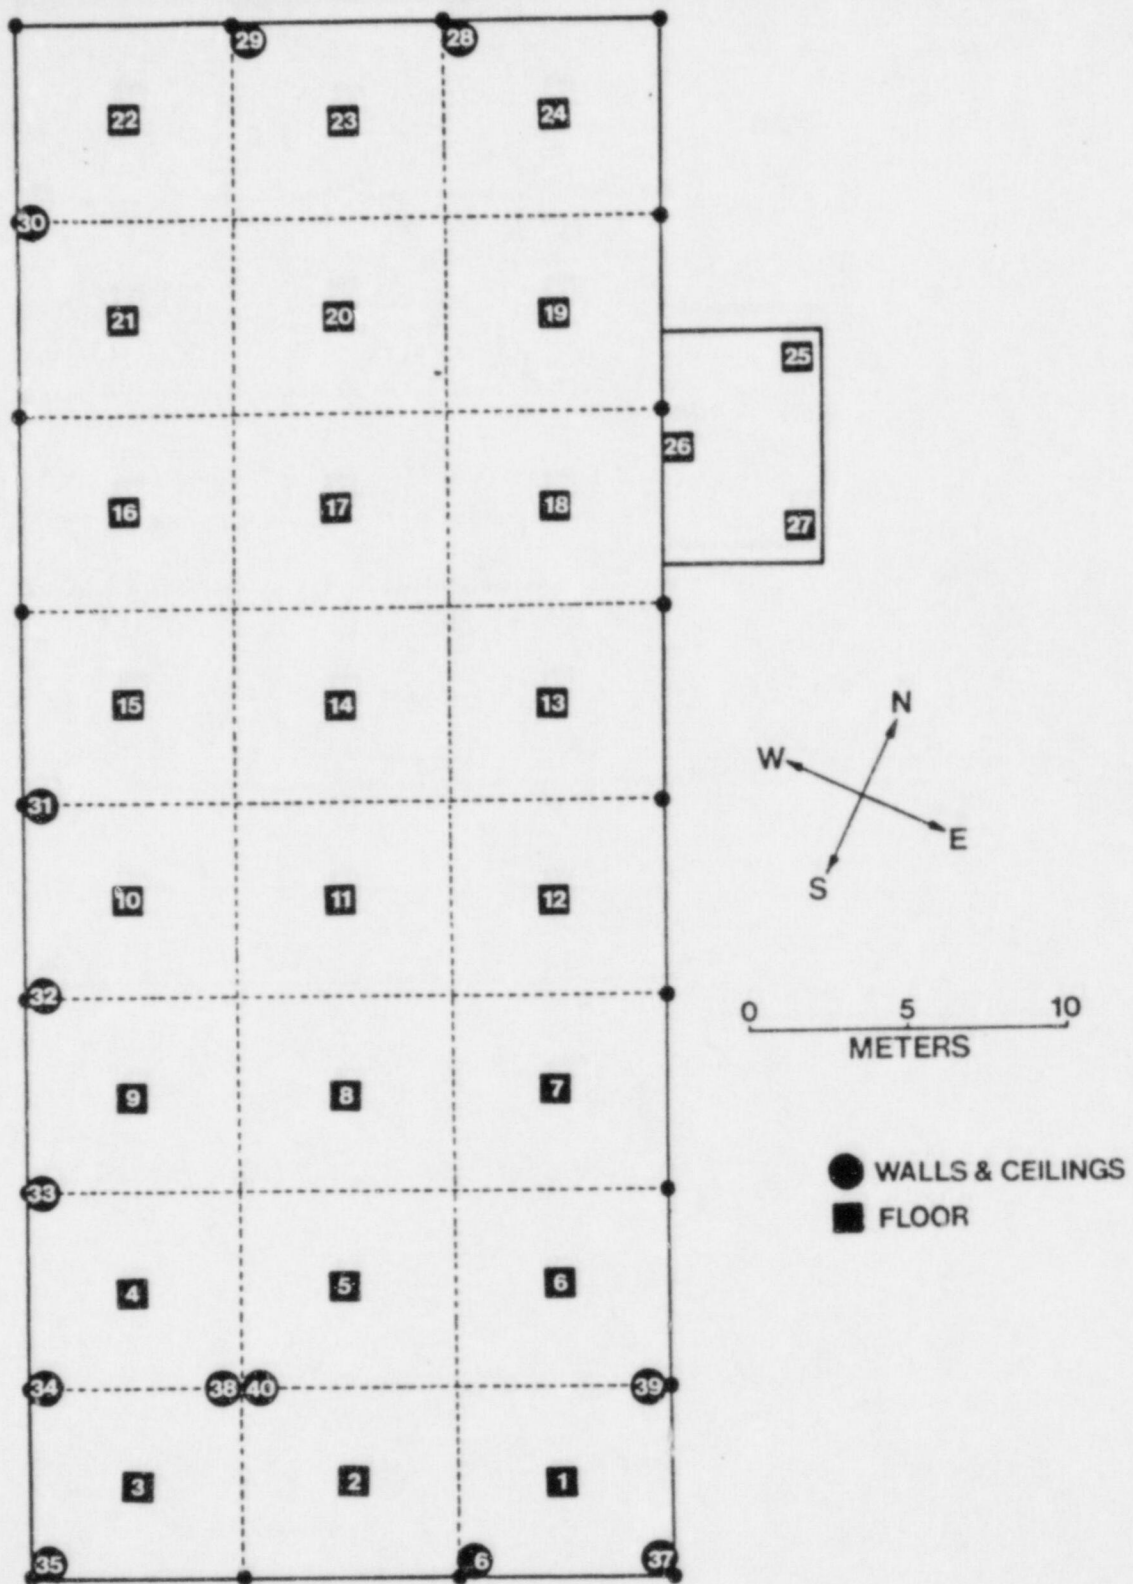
Floor Plan of the Benefco Building Indicating Locations of Measurements and Smears
